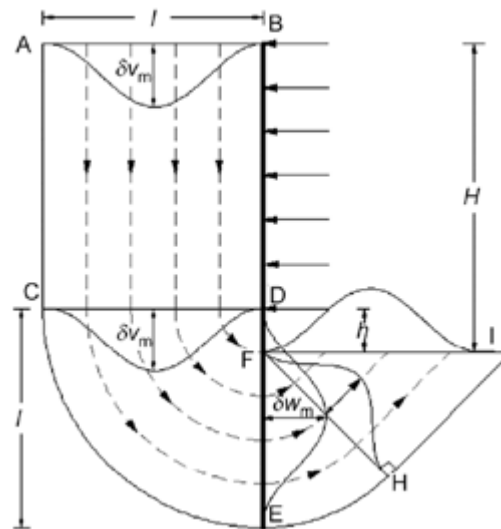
Theoretical figure (against one wall of an excavation) as proposed by Osman and Bolton (2005). Adapted from Wang and Long (2014).
